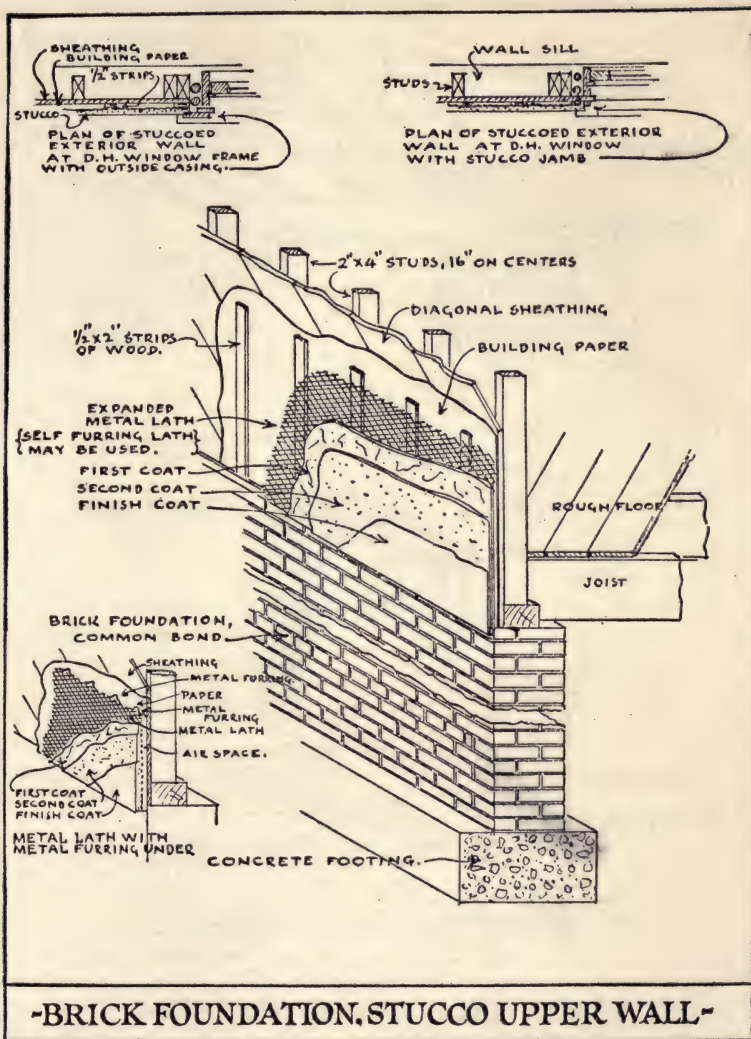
Dependent upon local conditions, brick is also a good foundation material. All joints should be thoroughly filled with mortar. Stucco on the exterior wall must be very carefully applied. Its permanence will depend upon the skill of the individual mechanic who does the work. Self-furring lath eliminates furring strips.
